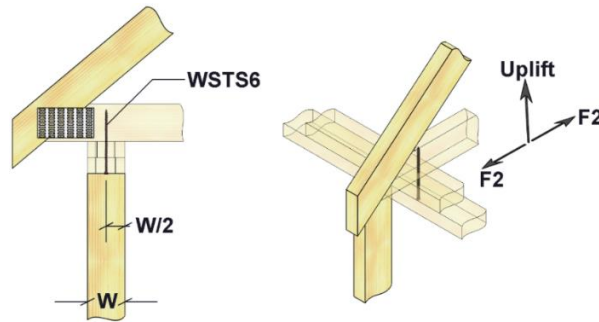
CONNECTION OF DOUBLE TOP PLATES TO BEARING TRUSS WITH WSTS SCREWS
